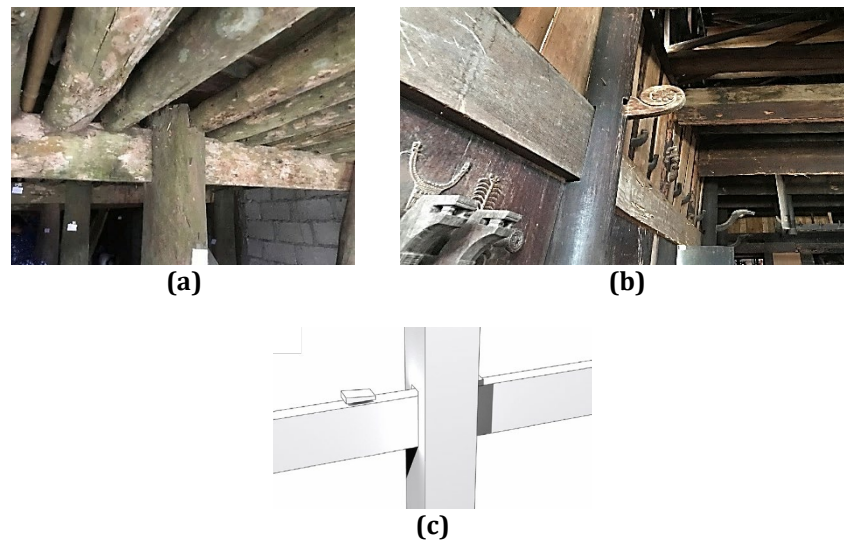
Schematic model of column to beam connection (a) Existing joint of Botohilitano building; (b) Existing joint of Bawomataluo building; (c) Research by Moradei *et.al.* [18]
